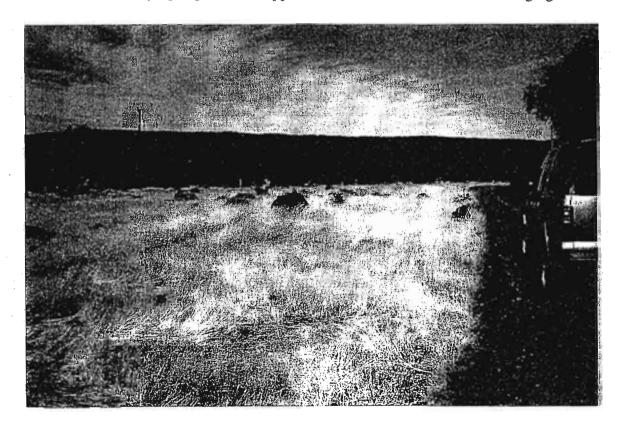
Rocky Springs Ranch - approximate location of construction staging area
